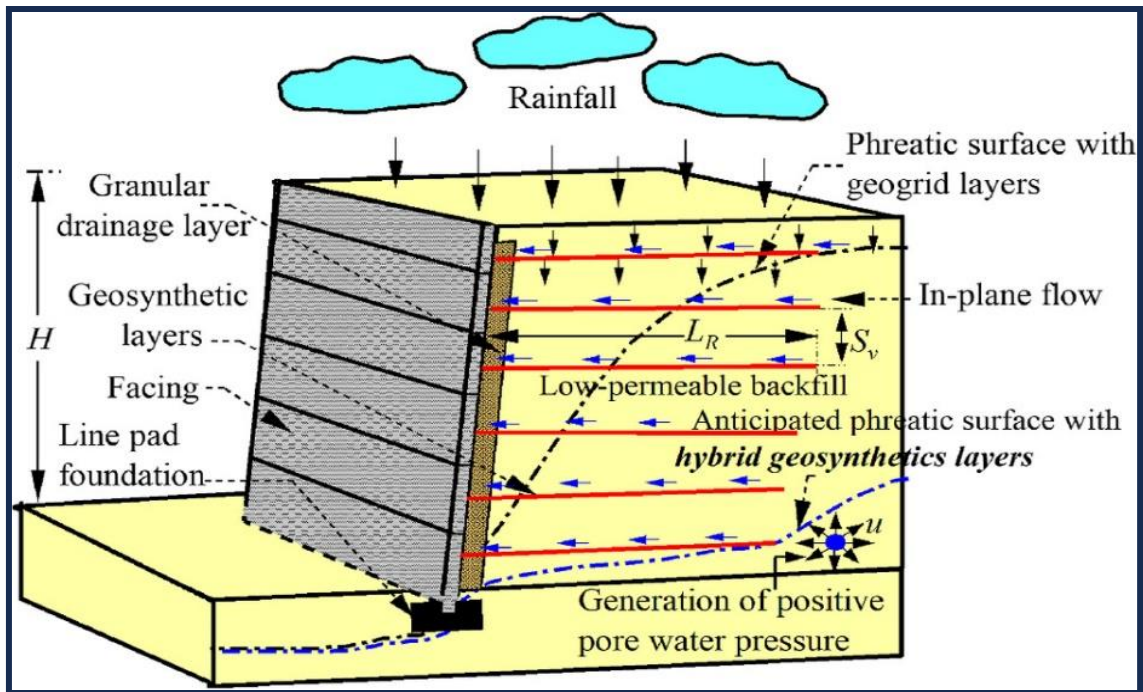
Geosynthetic Reinforced Soil Wall under Rainfall (after Midhula Jayanandan et al., 2024)
